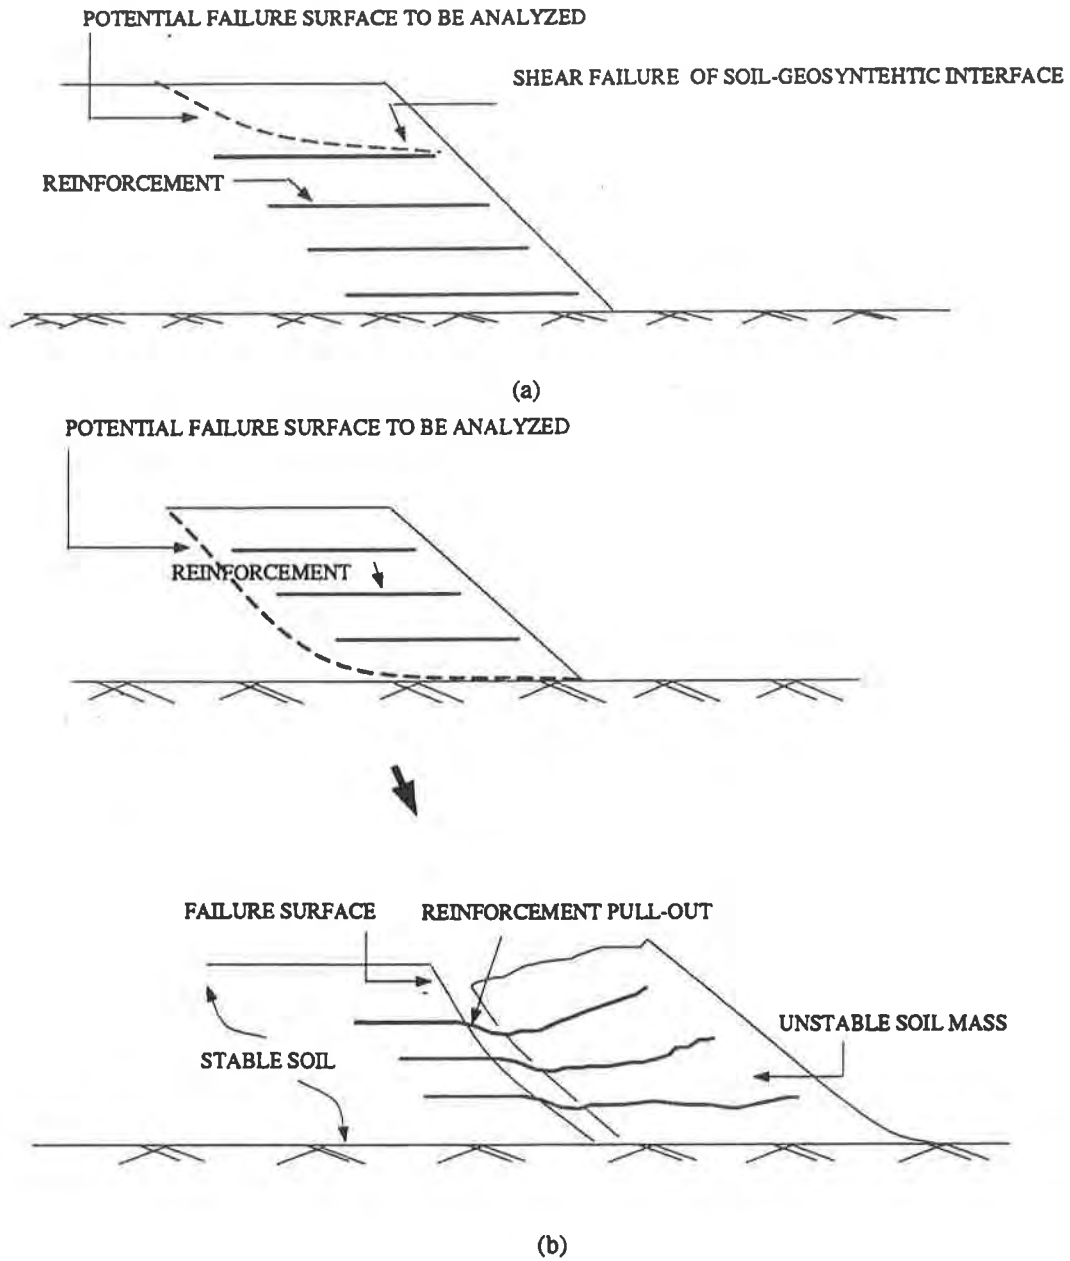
Illustration of Failure Modes in Soil Reinforcement Applications a) Shear Failure b) Pull out of Reinforcement
